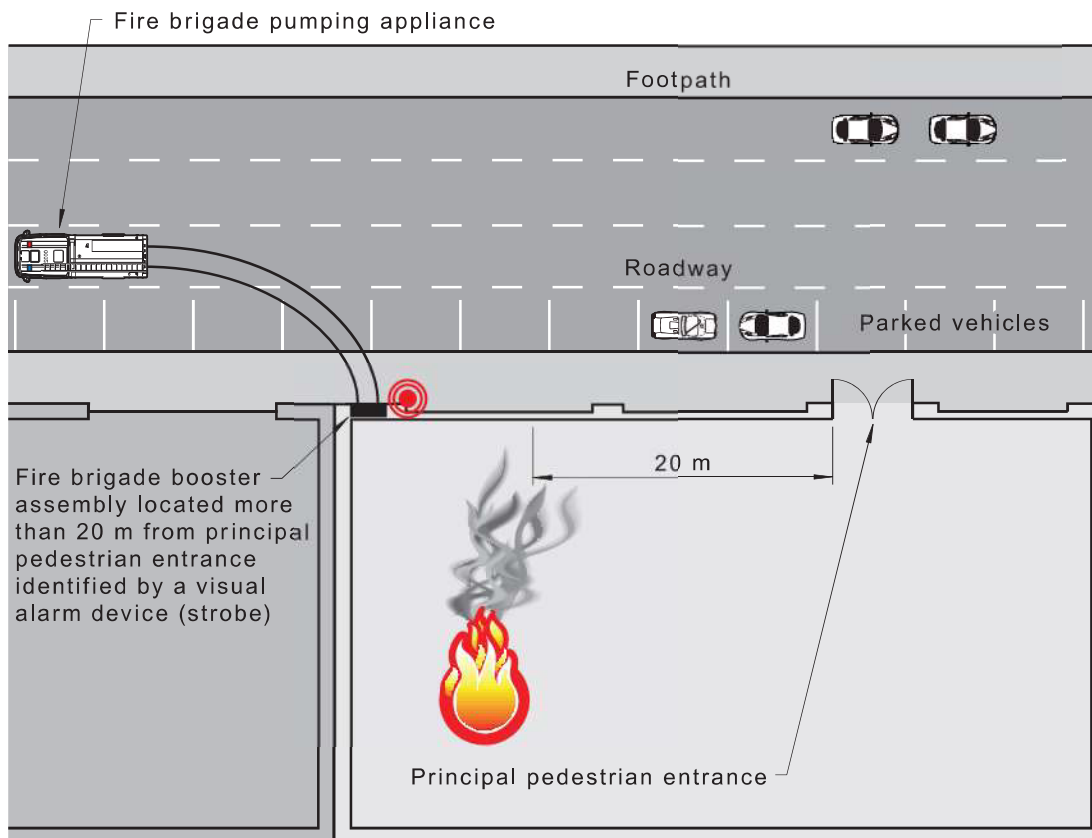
(A) — Fire brigade booster assembly location being identified by visual alarm device
